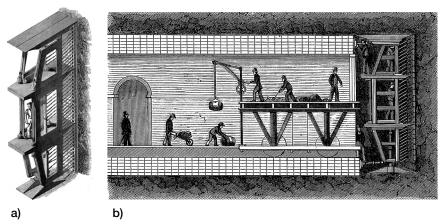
'Brunel's Shield' used for the first Thames Tunnel, a) one of the twelve frames making up the shield, and b) a cross section through this tunnel during construction (after Beamish 1862)
